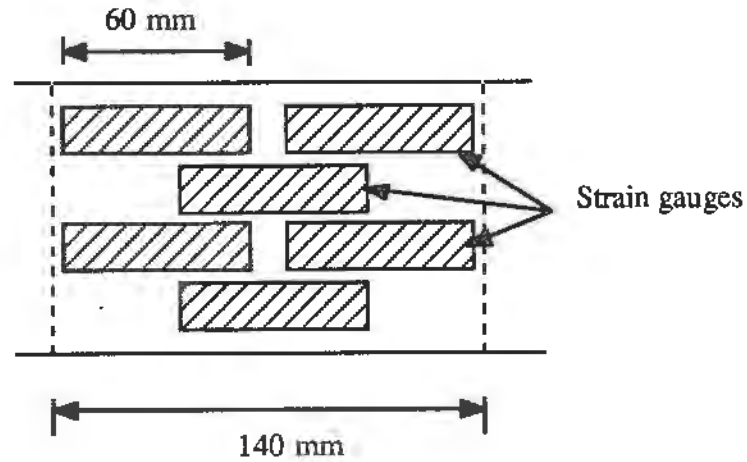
Strain gauge arrangement for crack observations on maximum tensile moment section of beam.
